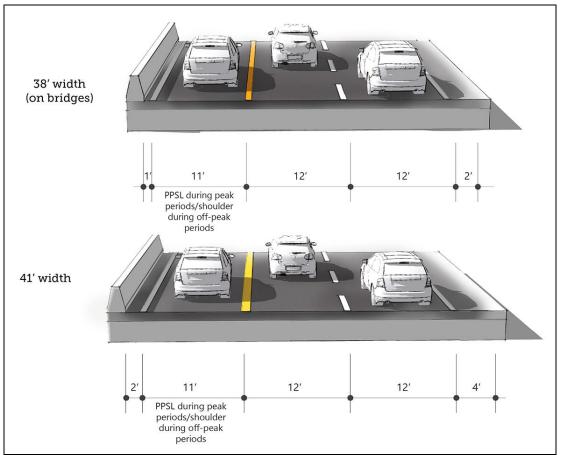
WB PPSL Proposed Action Typical Cross Sections
